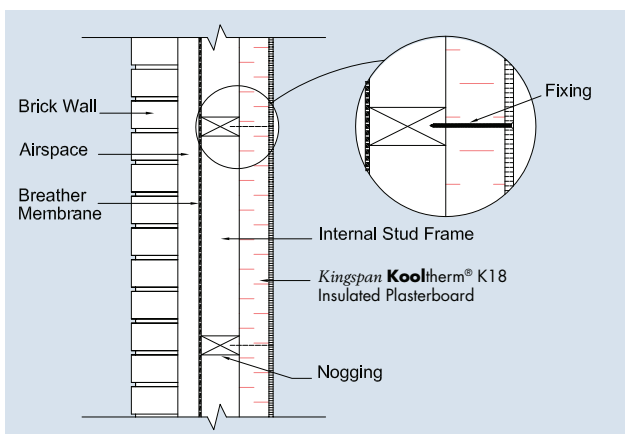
Side elevation - Brick veneer wall with *Kingspan Kooltherm*[®] K18 Insulated Plasterboard
